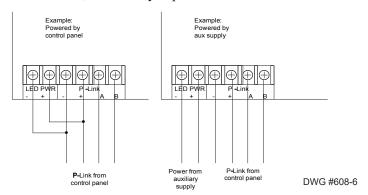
Examples of Wiring a LED-16/LED-16(F) Module to Control Panel or Auxiliary Power Supply
